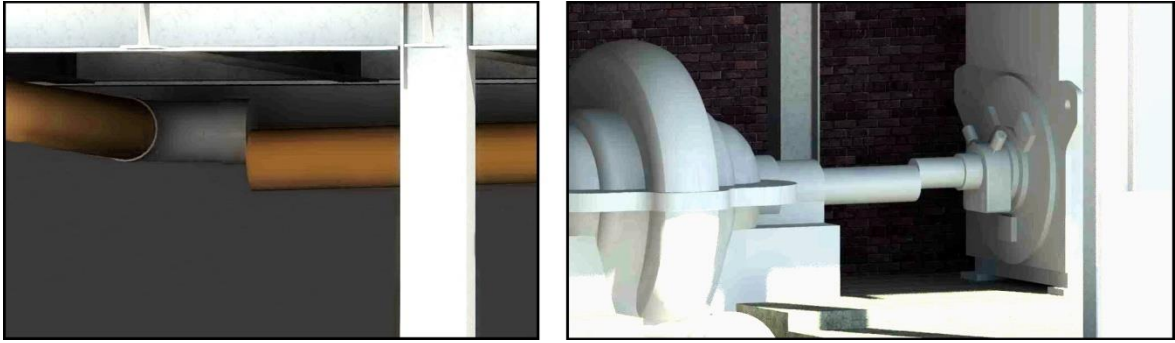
Pipe damage and pump shaft breakage outside the storage room
